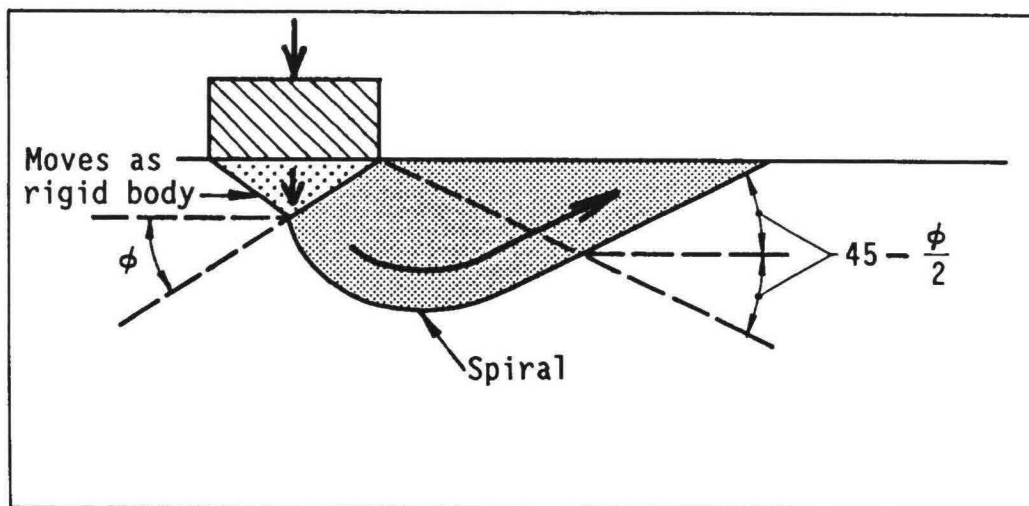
Failure Surfaces of a Strip Footing, (After Terzaghi and Peck, 1967)
